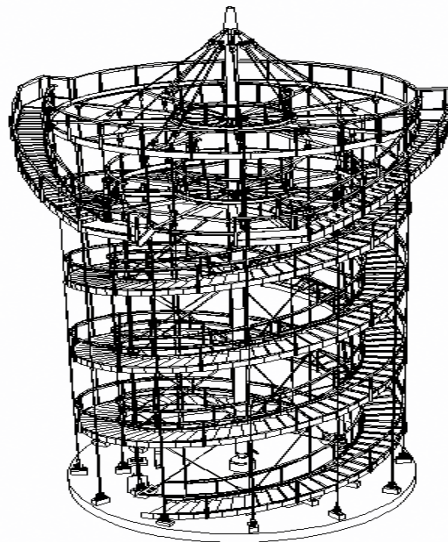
Observation tower, Stuttgart, Germany, Courtesy Schlaich, Bergermann and Partner
